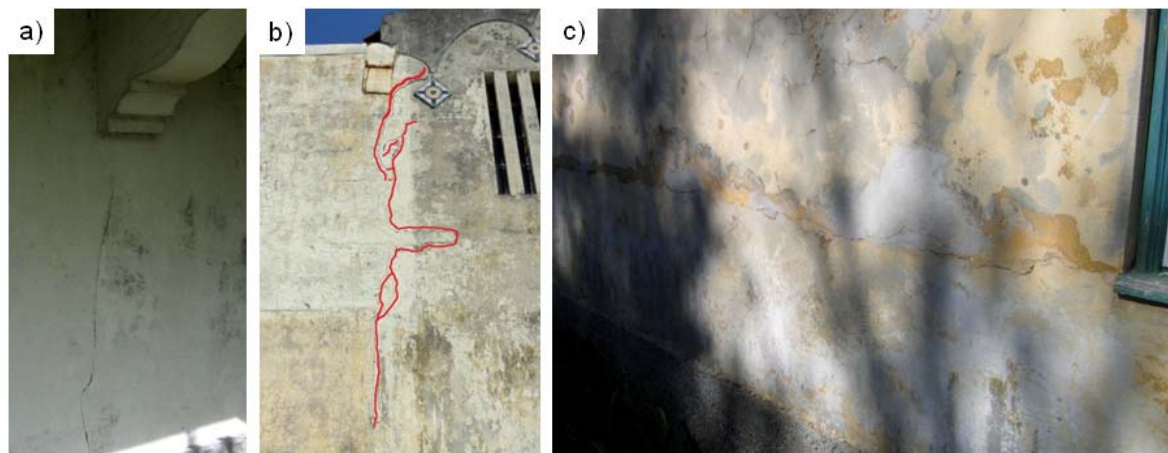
a) Localised cracking near the support of balcony; b) cracking in the connection to rear addition; c) long horizontal cracking.
